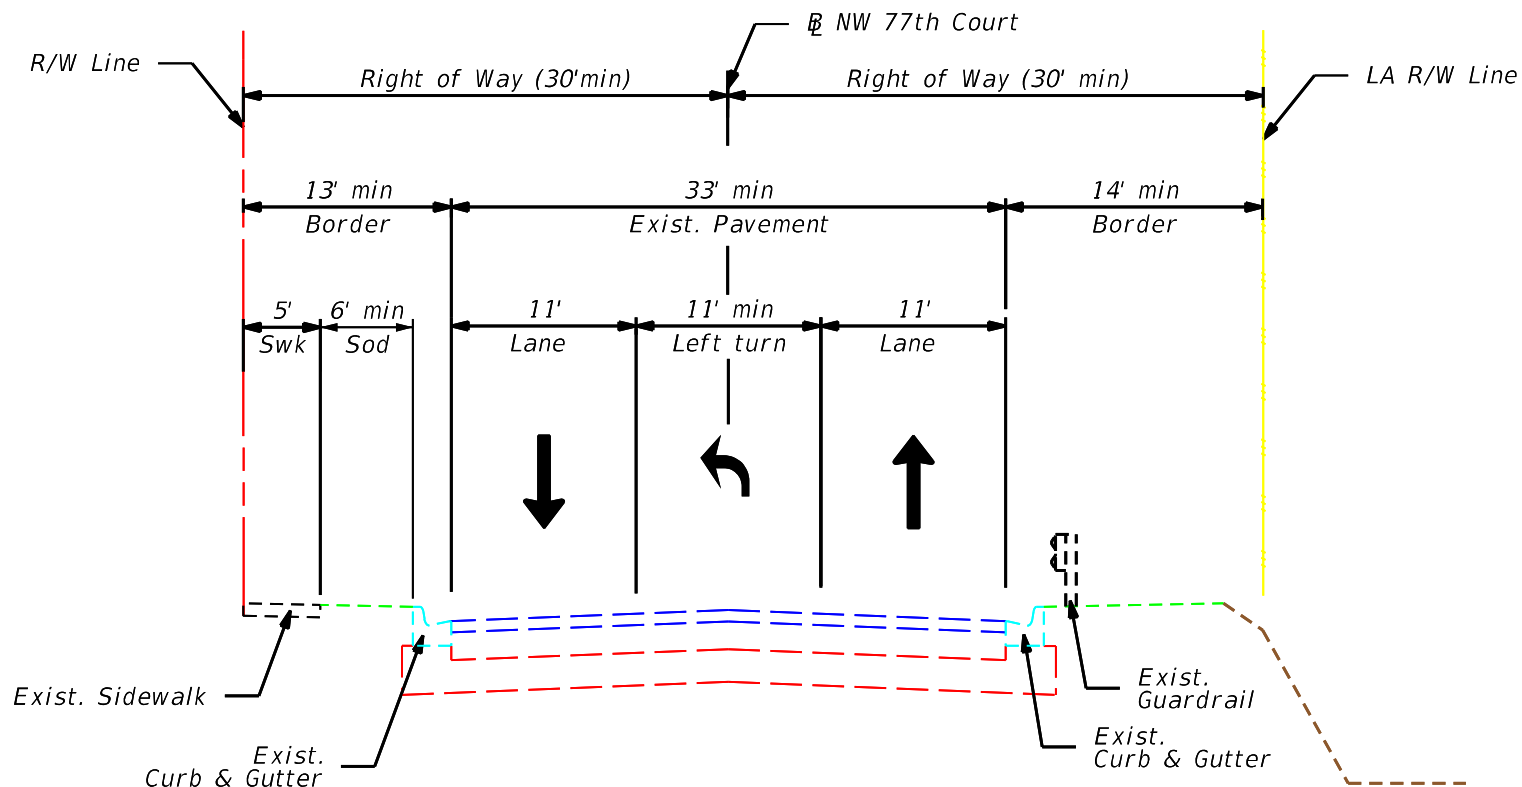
Existing Typical Section NW 77th Court from MP 0.153 to MP 0.385
